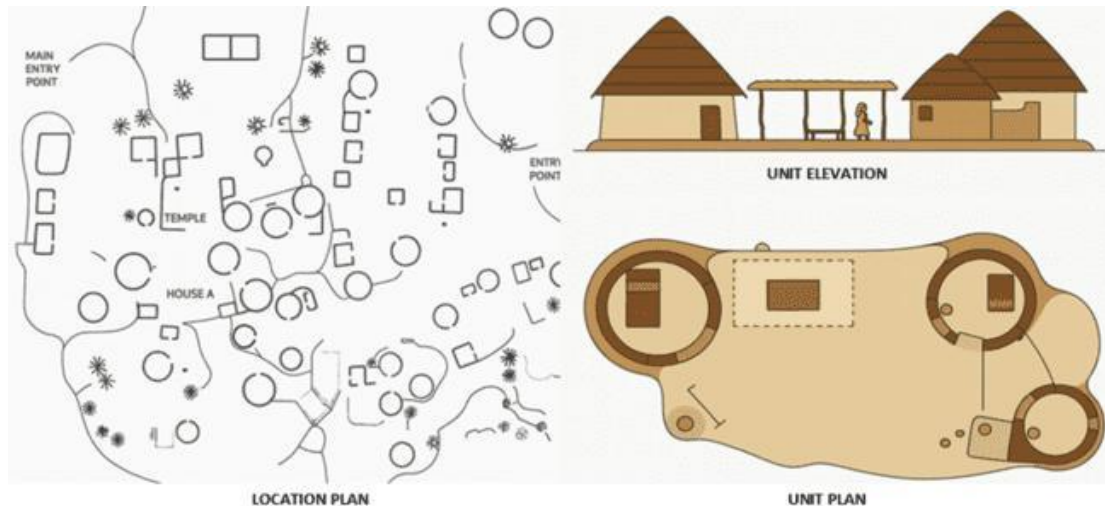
Location plan, unit plan, and unit elevation of traditional Bhunga settlement in Kutch, Gujarat
